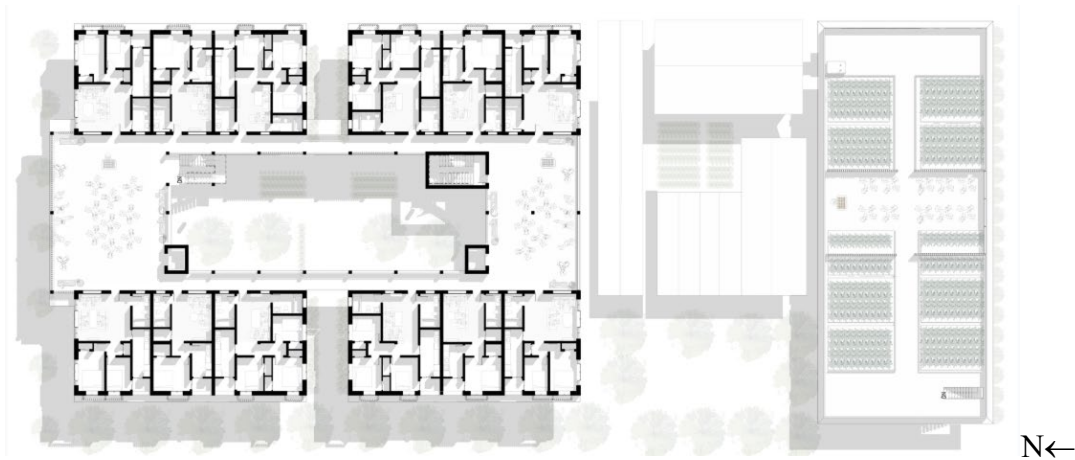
3rd Floor plan of the proposed design: multi-family apartment on the left and the rooftop garden of the studio apartment on the right (source: by the author)
